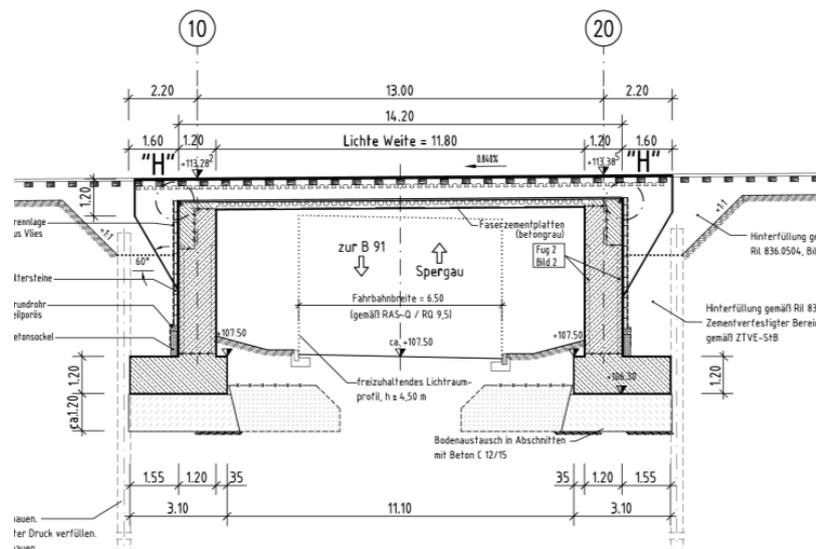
Longitudinal section railway crossing over K2174 (Maienweg) in Leuna
